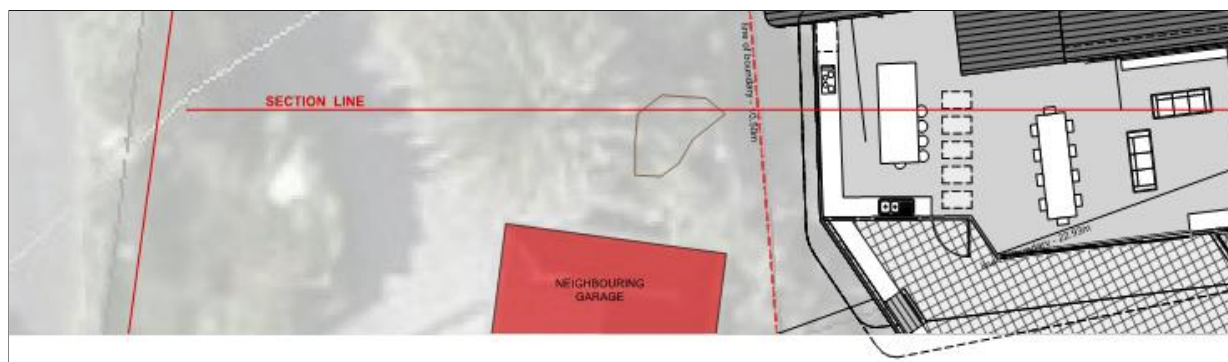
Location of proposed kitchen window in regard to adjoining garage
